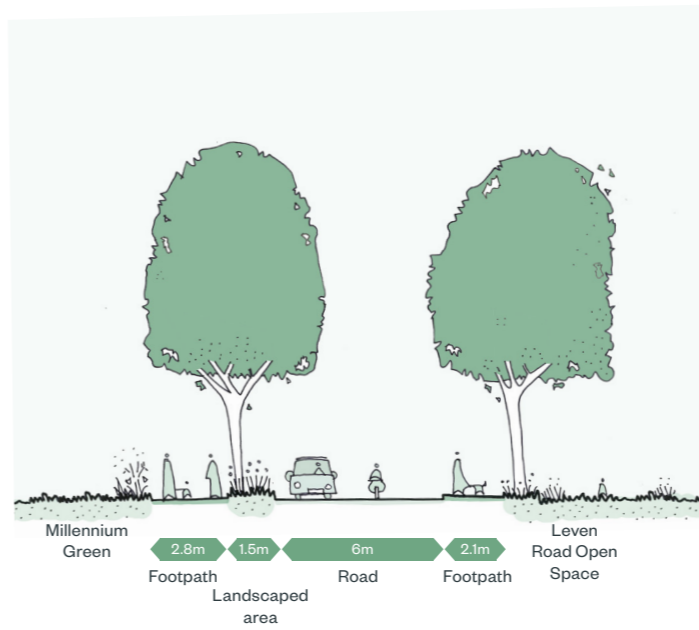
Illustrative street section AA - primary street (Abbott Road)
